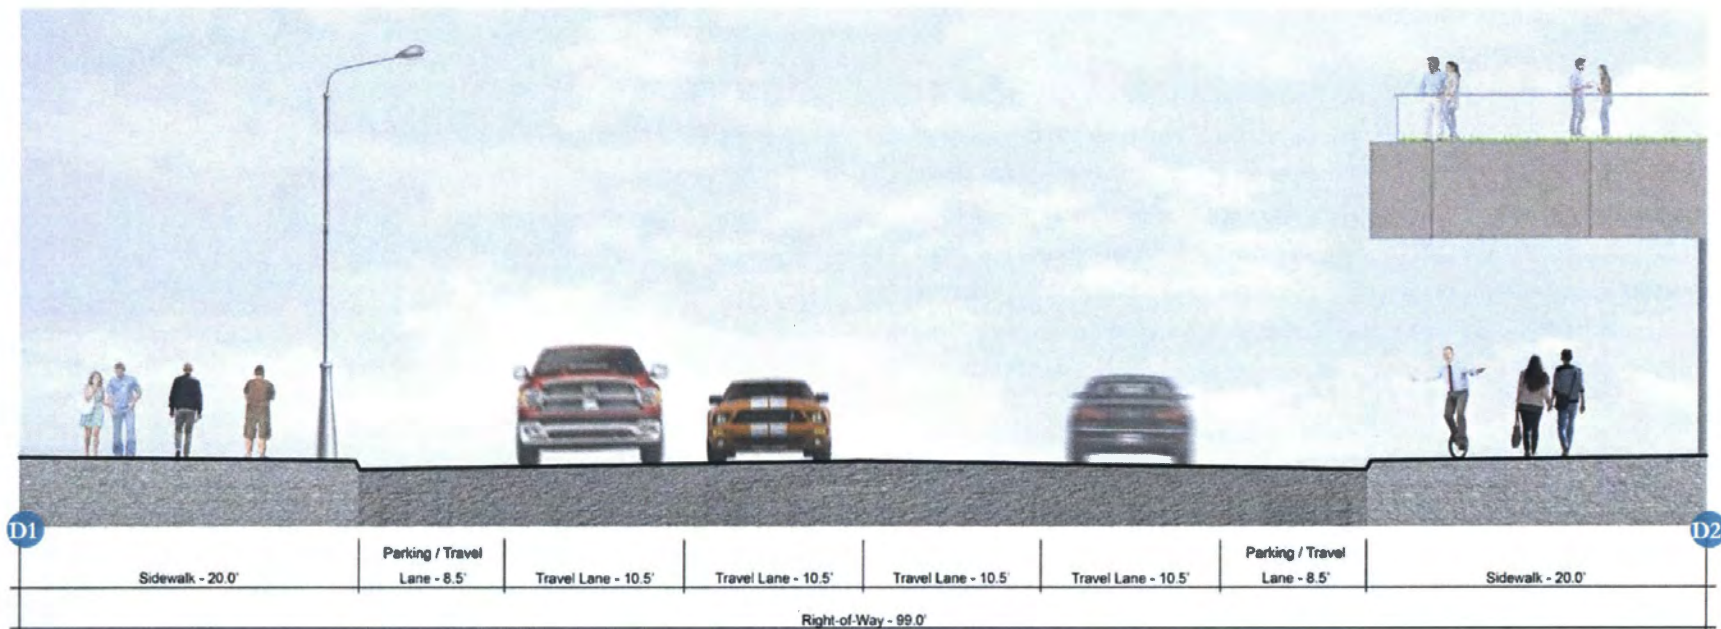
Lakeside Avenue between E Mall Dr and W Mall Dr Existing Section
